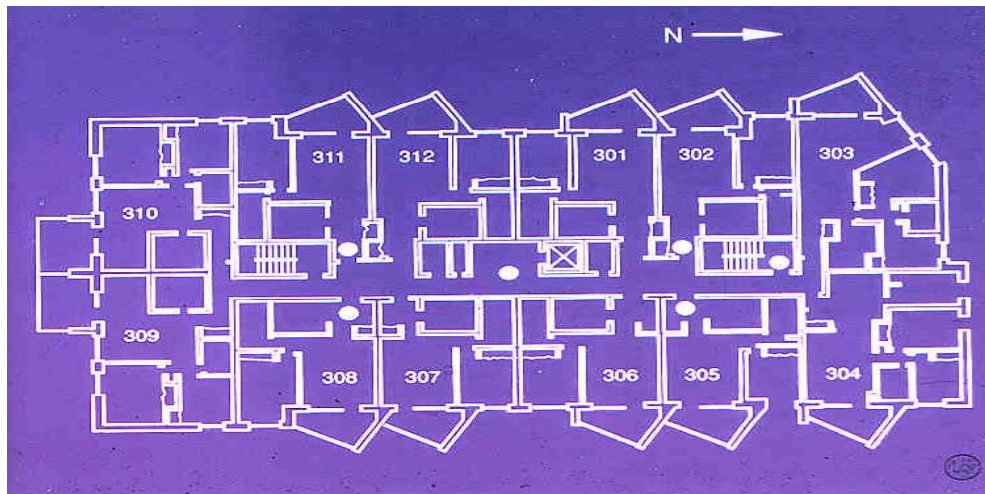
Floor plan of a typical floor in a five-storey apartment building
